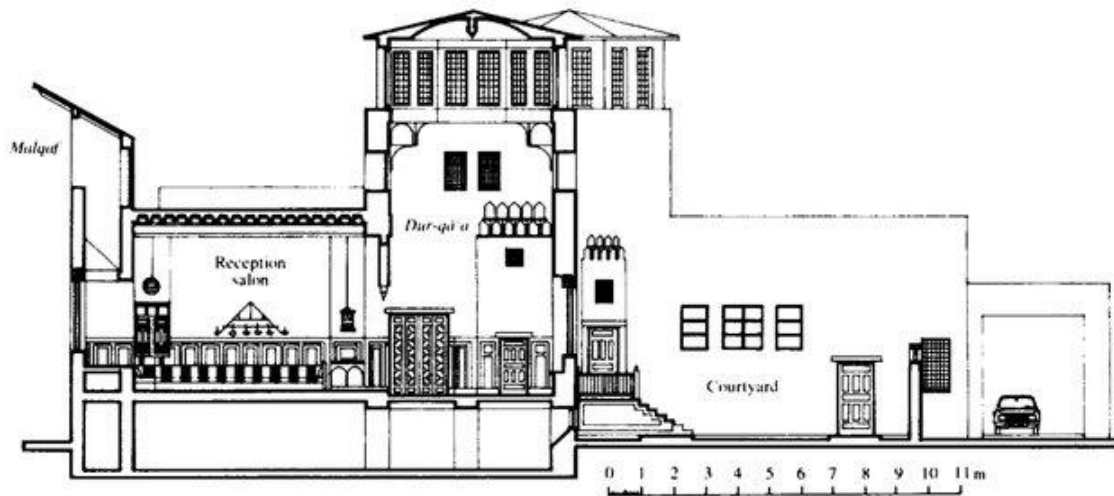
An Example of the tower house, Nassif House, in Jeddah, Saudi Arabia, (New Zealand Digital Library)
